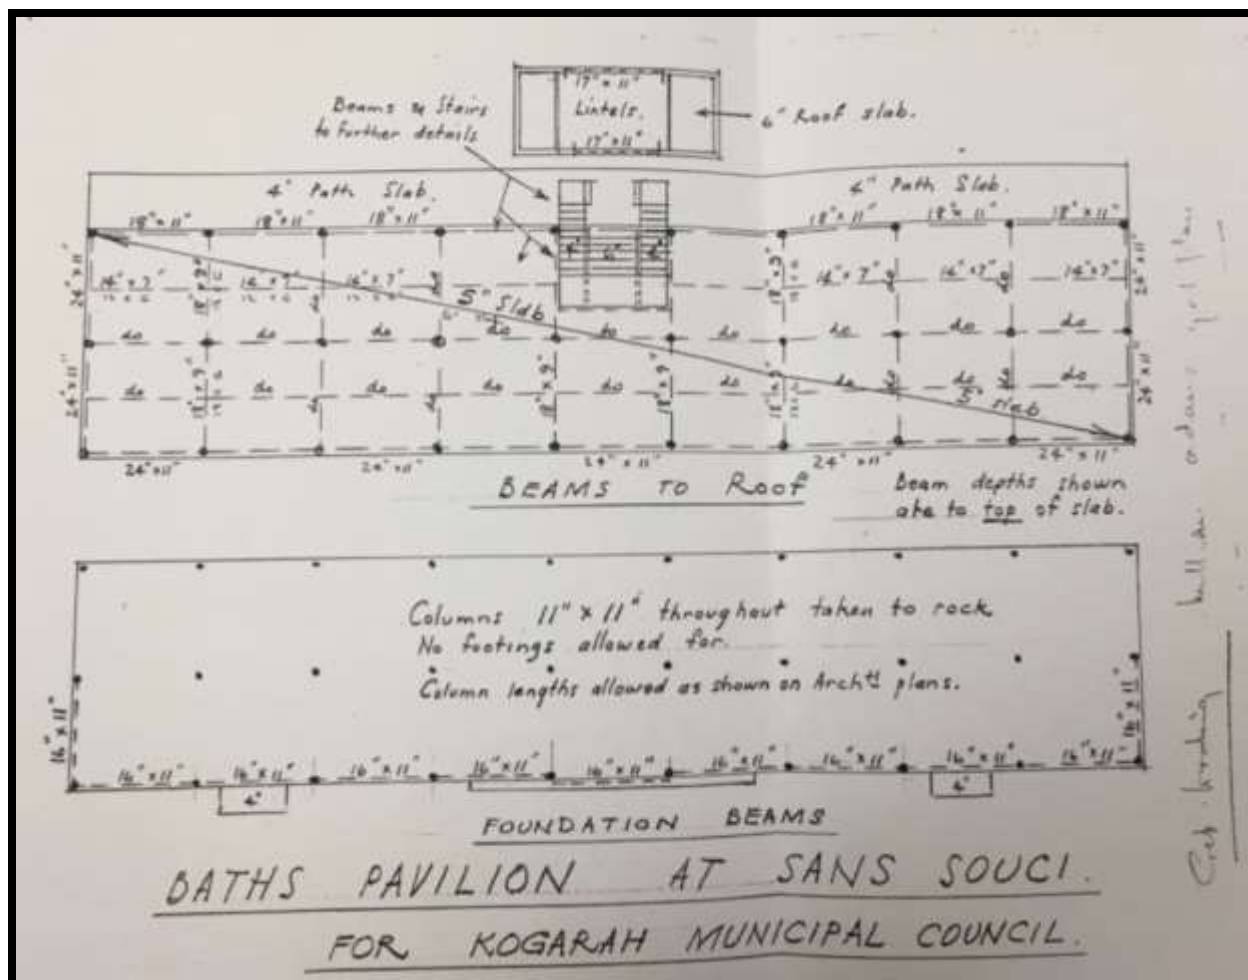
Plans prepared by The Australian Reinforced Concrete Engineering Co Pty Ltd for the Pavilion at Sans Souci Kogarah Local Studies Library (Courtesy Weir Phillips Heritage, 2018)
